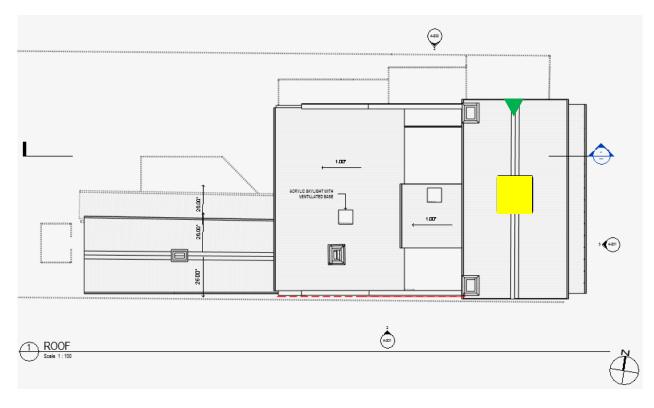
Roof Plan – as proposed – the yellow shaded area exceeds the LEP height limit by a maximum of approximately 1 055 mm and the greenshaded area by some 150 mm.
